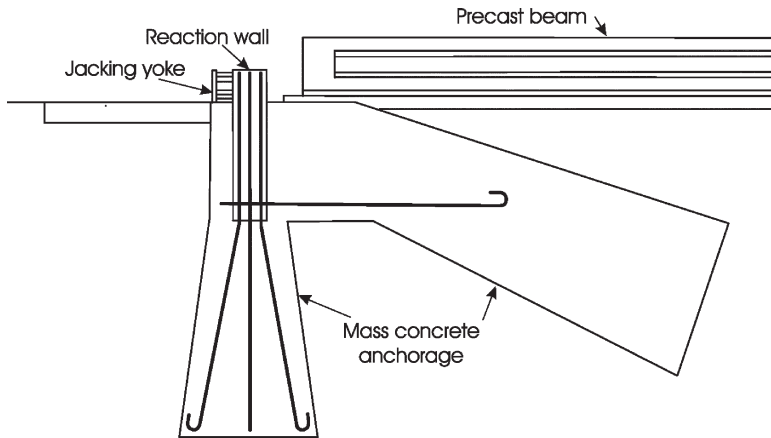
Anchorage block at Monkton Farleigh stressing bed<sup>5</sup>
